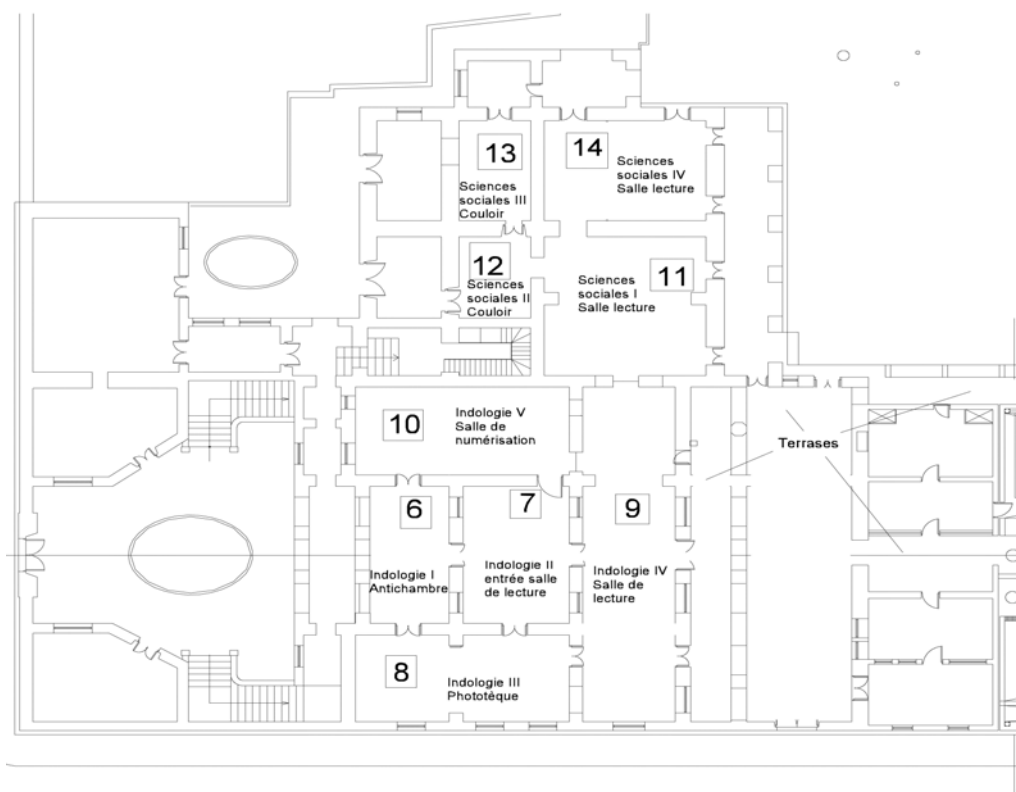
11, Saint Louis Street. Rez-de-chaussée.
